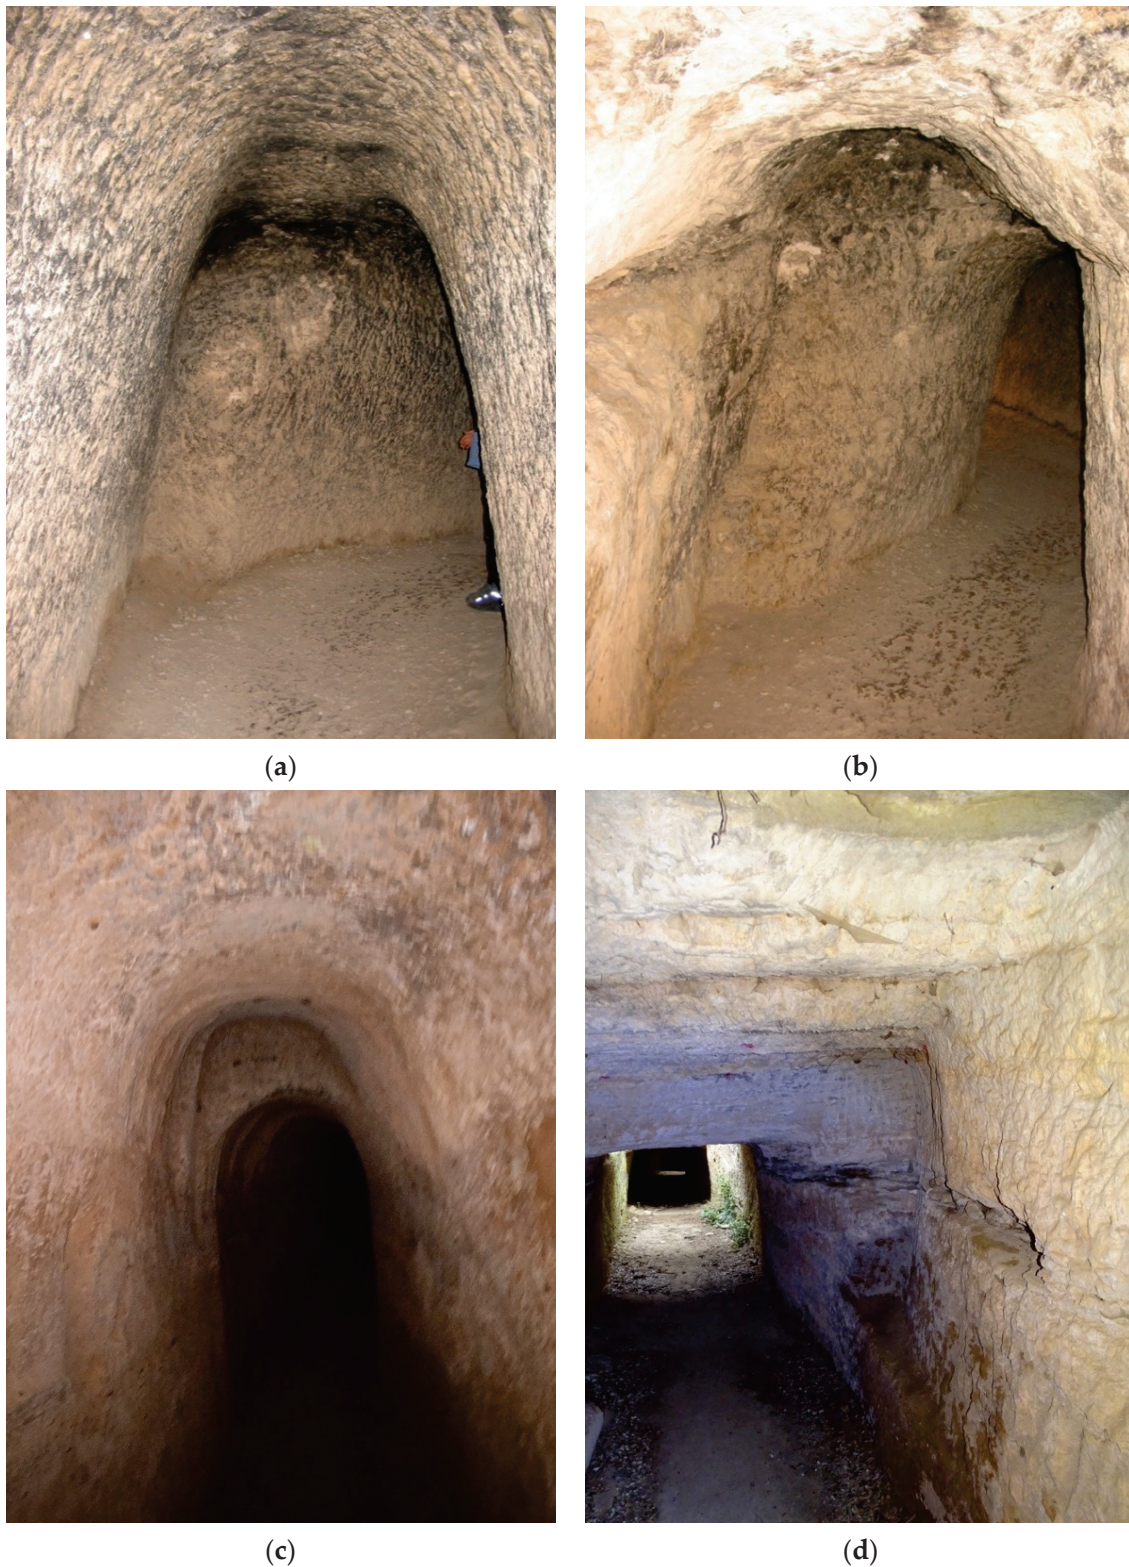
The meeting point between two excavation sections in several tunnels: (a) the Chelva tunnel, Spain, with horizontal offset. The view is towards the end of a section of the gallery that meets another one at the right-hand side (person visible). (b) A similar meeting point, with a major horizontal offset and small vertical offset, Chelva aqueduct. (c) The meeting point of the aqueduct tunnel of Tiermes, Spain, with a vertical offset. (d) Meeting point with vertical offset in the Sernhac tunnel of the Nîmes aqueduct. The tunnel has a flat roof because of the strong horizontal stratification (Photos Cees Passchier).
